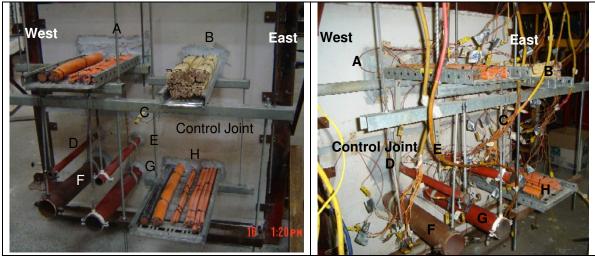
Unexposed face of test specimen prior to commencement of the test.
